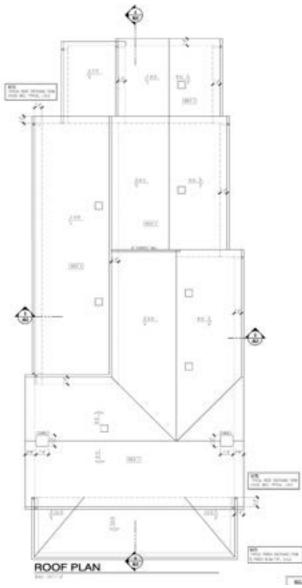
The roof plan provided as part of this submission. The location of the chimneys has been slightly altered from the previously approved shown on Figure 4, and gutters have been added.
